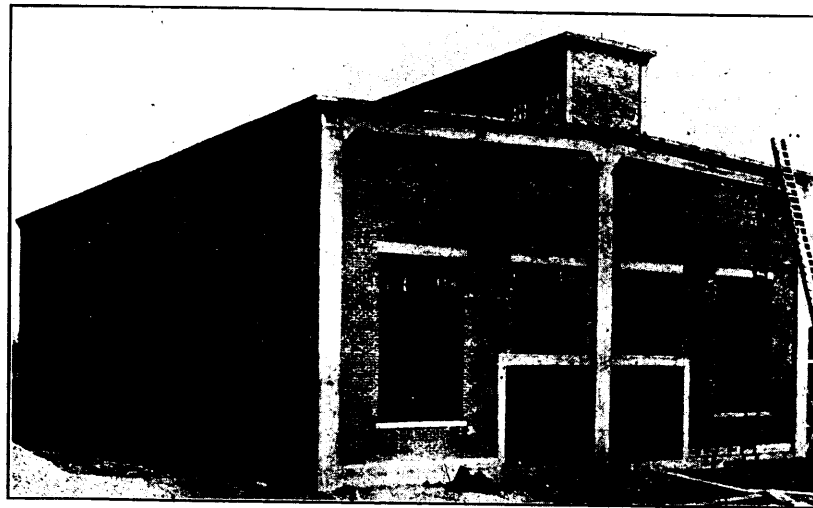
PLANT OF CANADIAN BILLINGS AND SPENCER LTD.—FORGING DEPARTMENT.
